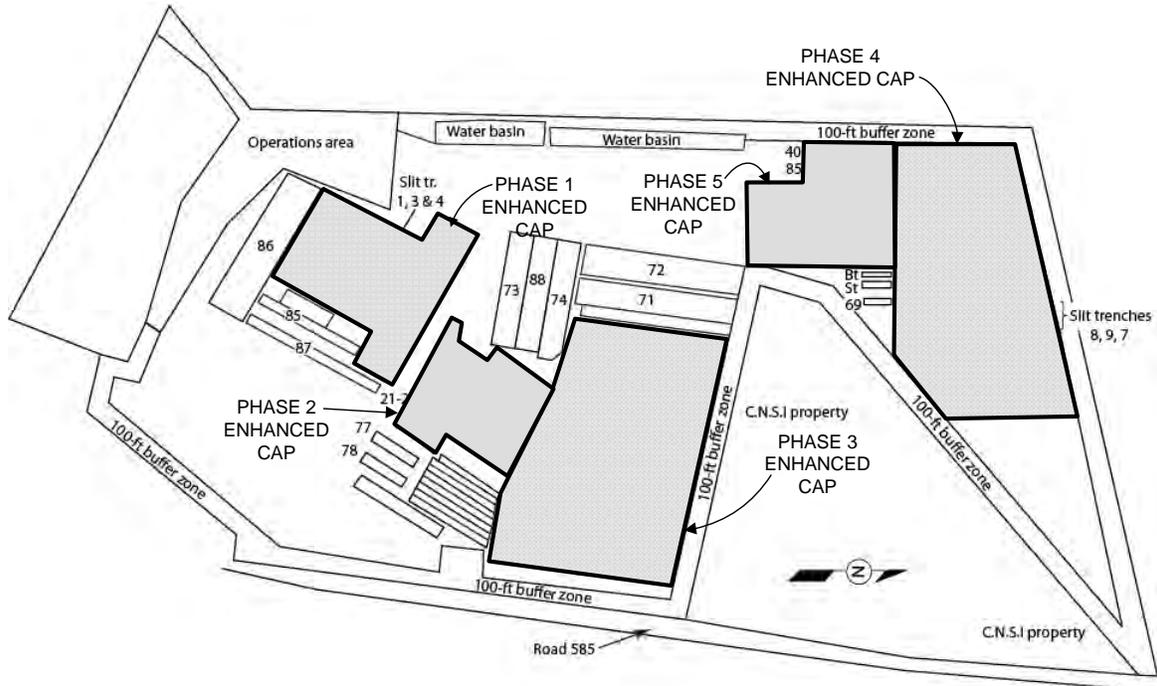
Layout of Barnwell LLRW Disposal Facility
